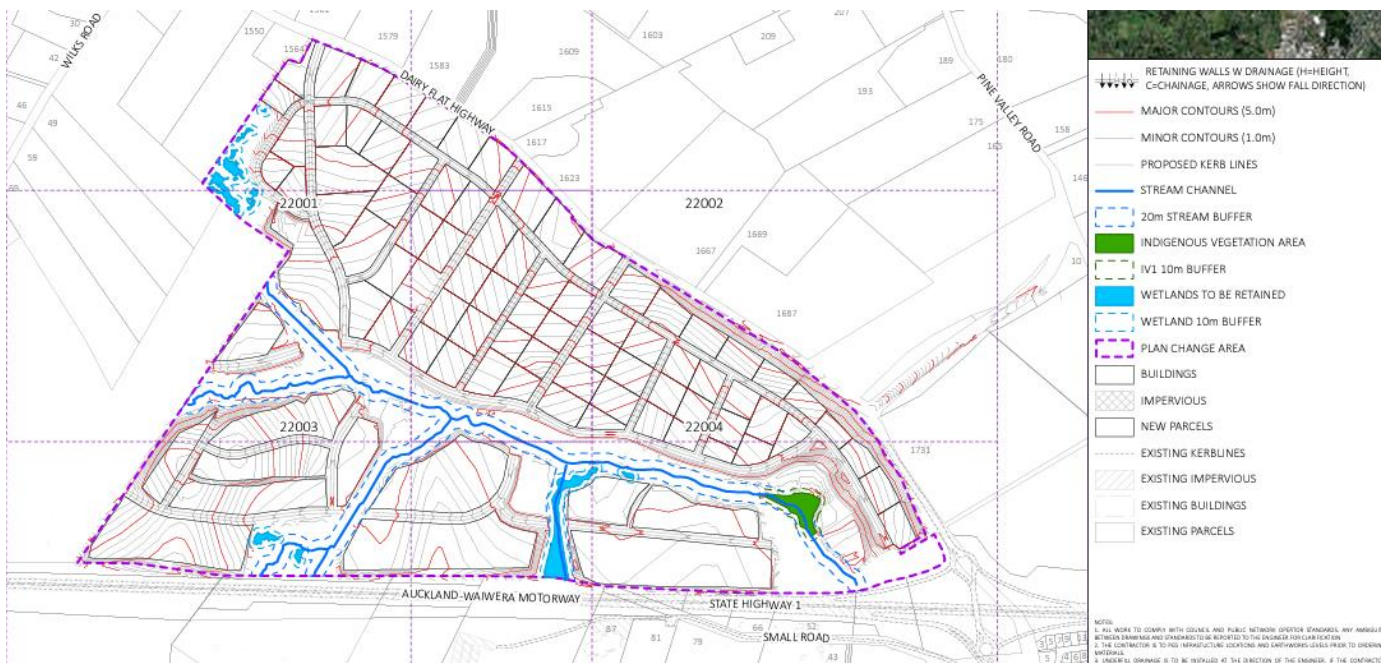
The PPC 103 plan showing riparian margins, Drawing 2200, dated 31 March 2023 in Silverdale West Plan Change Stormwater Management Plan, 23 May 2024. Note: Figure 4 proposed layout plans extends beyond the area of the PPC 103
